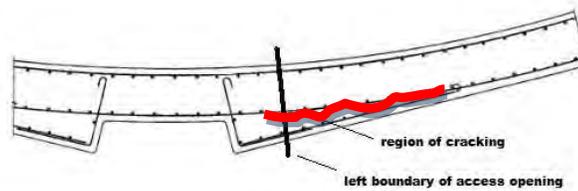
Cracking in Flute shoulder Region to the Left of the Construction Opening
